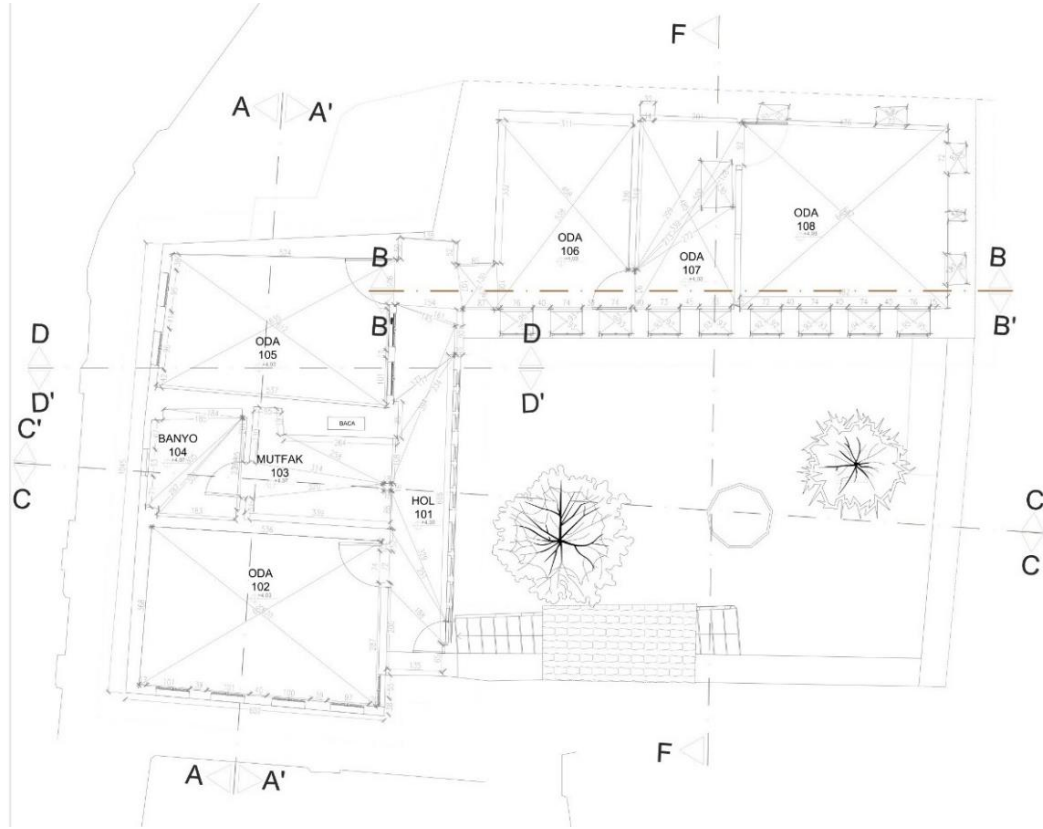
First floor plan of Ülkü-19 House (Akat et al., Mersin University Graduate Program in Conservation of Cultural Heritage, Restoration Project for Ülkü St. No:19 House, 2019)
